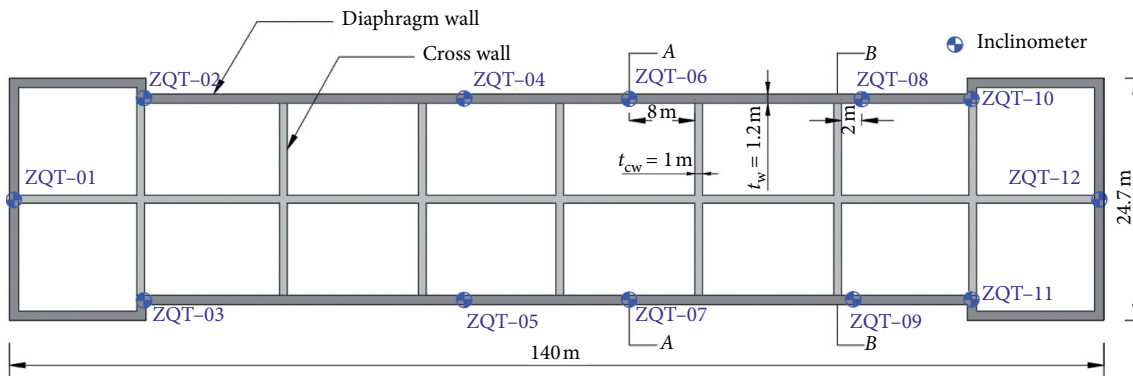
Geometric plane of retaining wall and monitoring layout.
